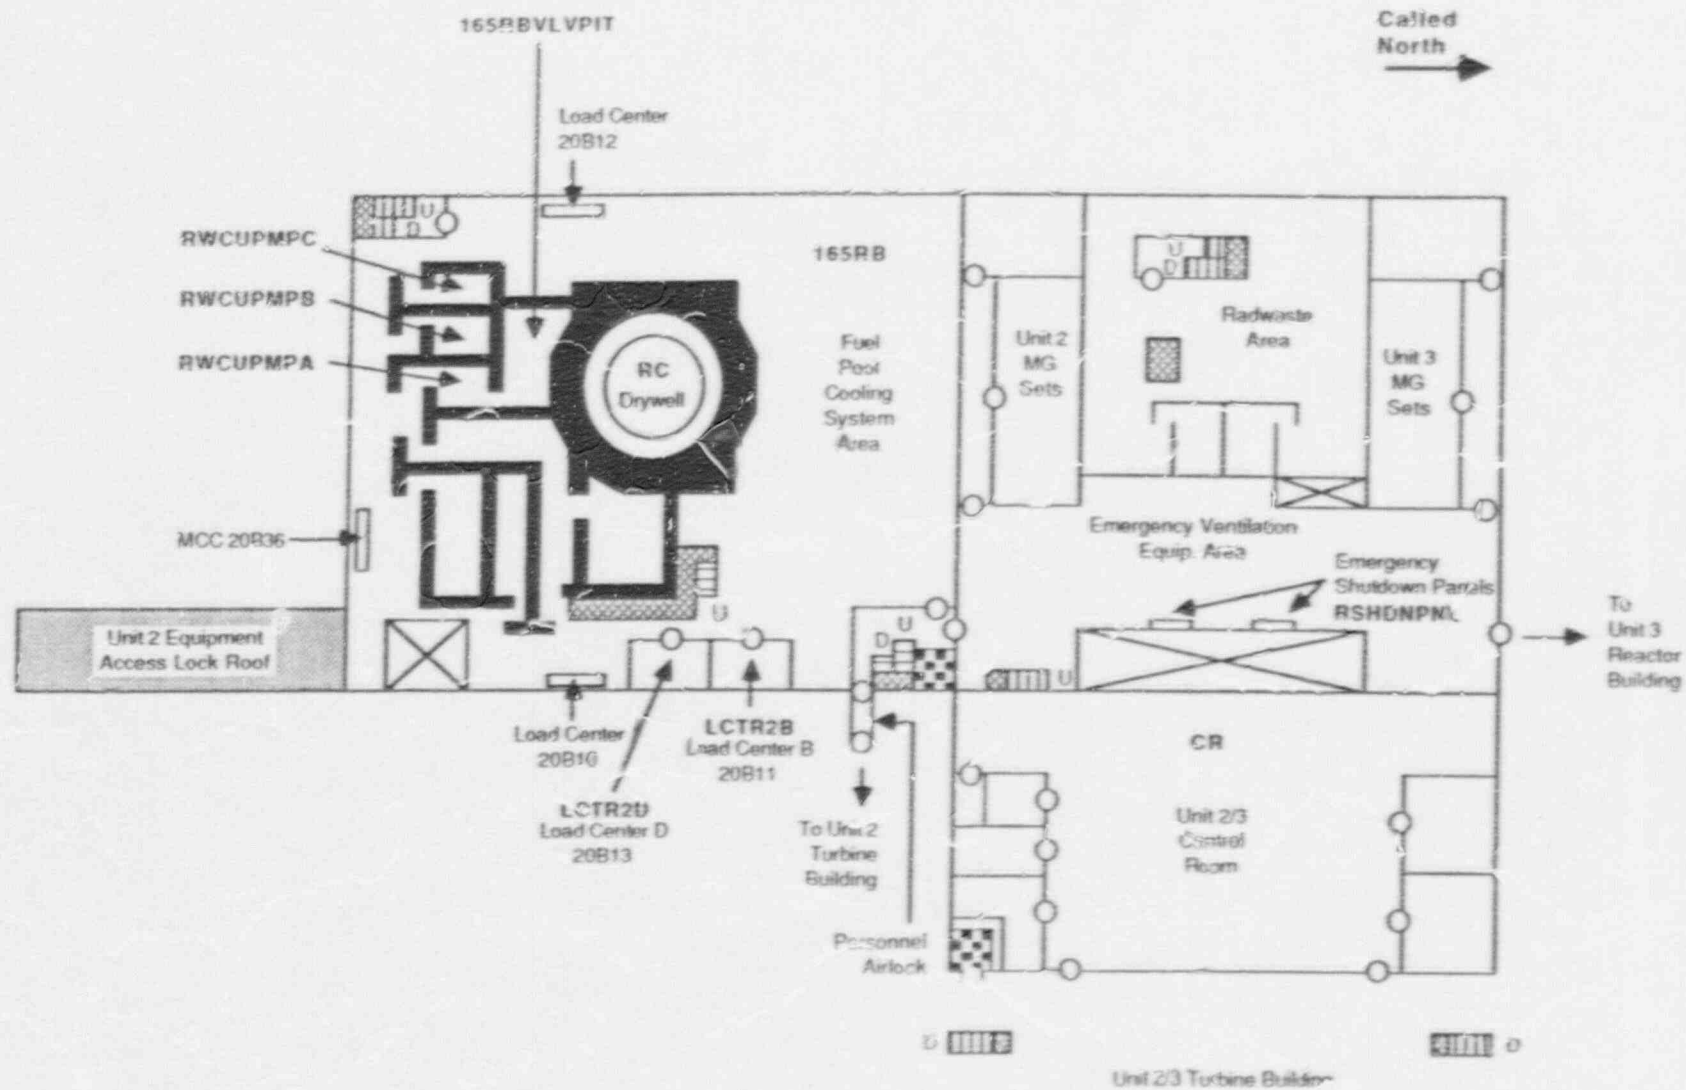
Peach Bottom 2 Reactor and Radwaste Building and Unit 2/3 Switchgear Rooms, Elevation 165'0"
